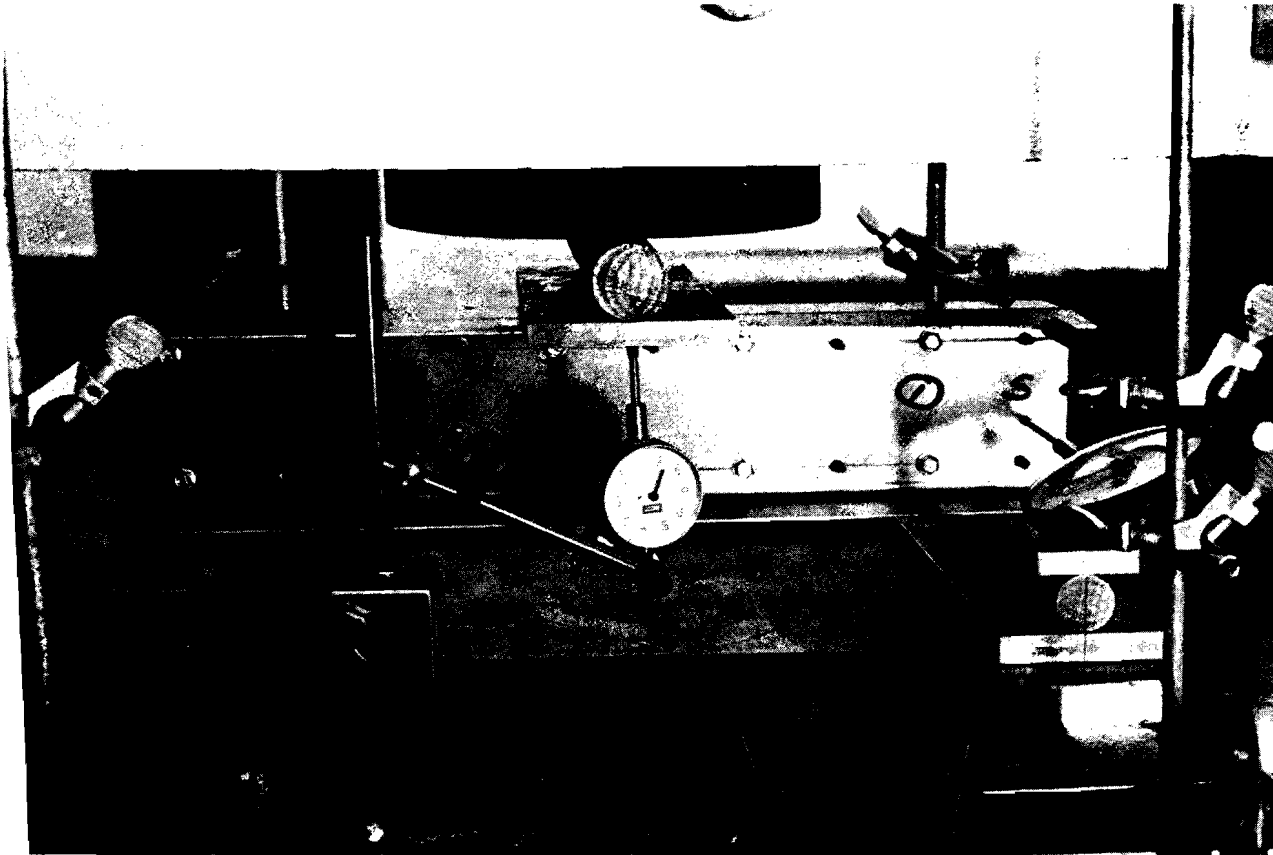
Photograph of Test Setup for End One-Flange Loading Condition of I-beams
